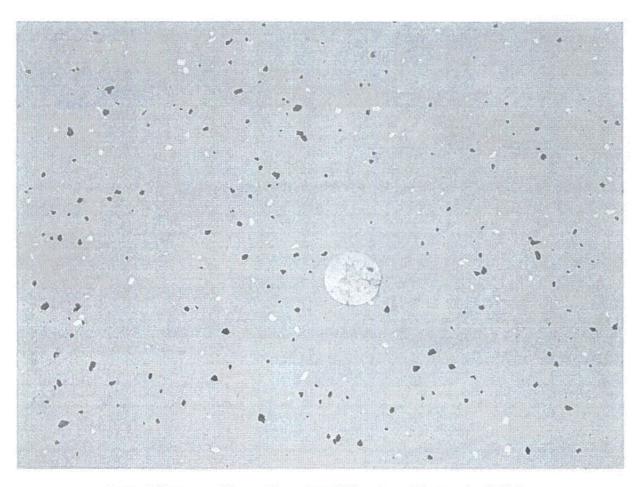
Equipment Tag on Floor at 130' Elevation of the Reactor Building
